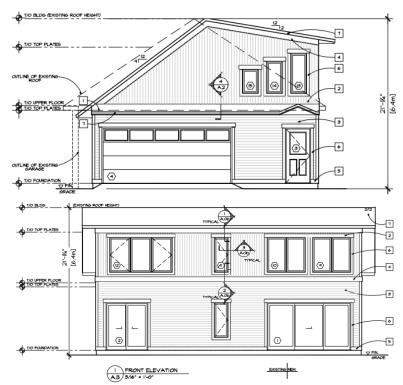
Applicant's proposal. Upper wall extends the full width of the lower wall, and is the main roof line.
